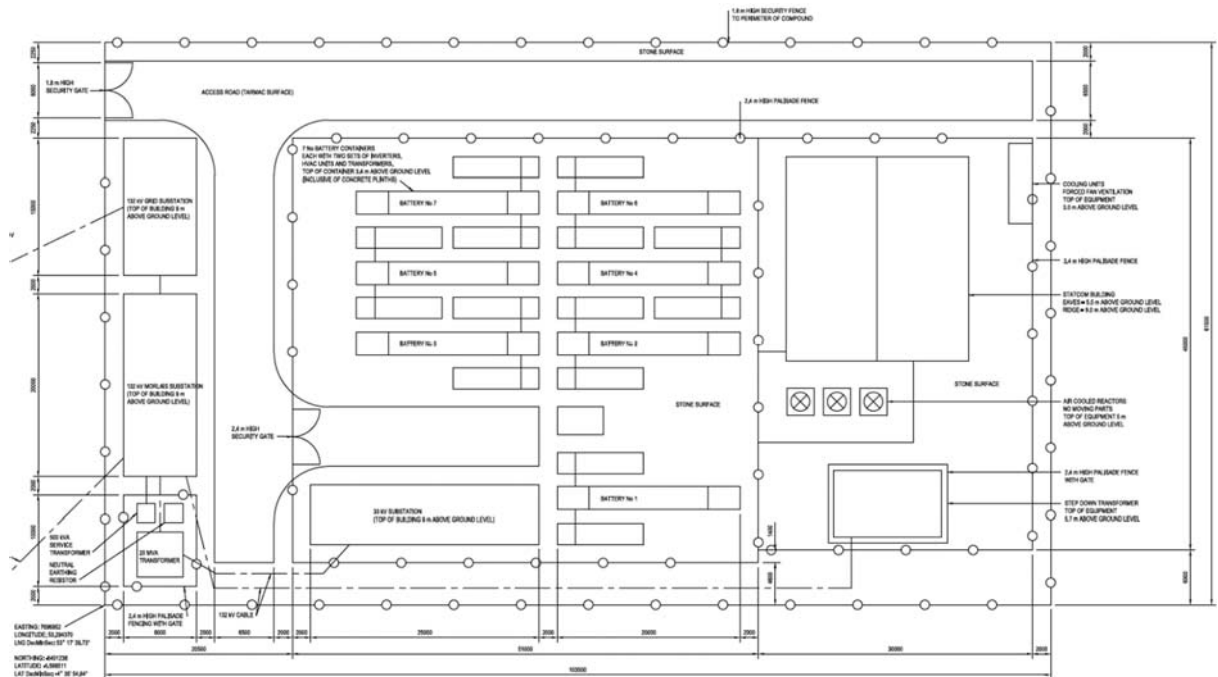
Indicative Site Layout – Grid Connection Substation
